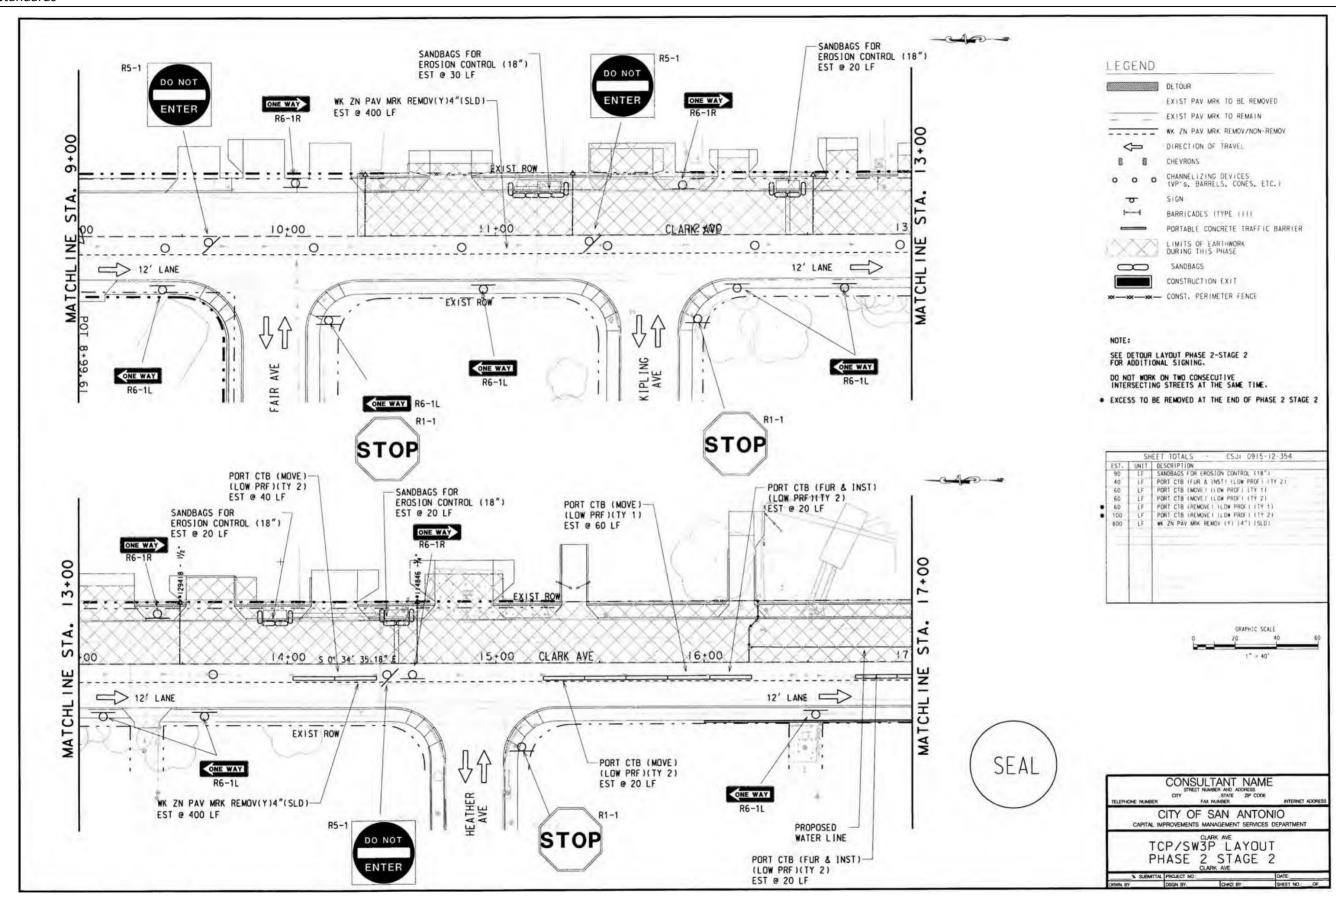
Example Traffic Control Plan / SW3P Phasing Layouts
